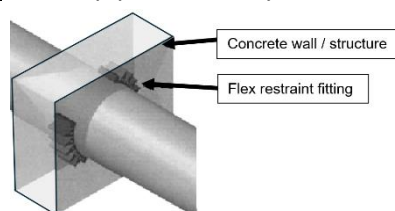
Example of flex restraint fitting where PE pipe passes through a wall or chamber
